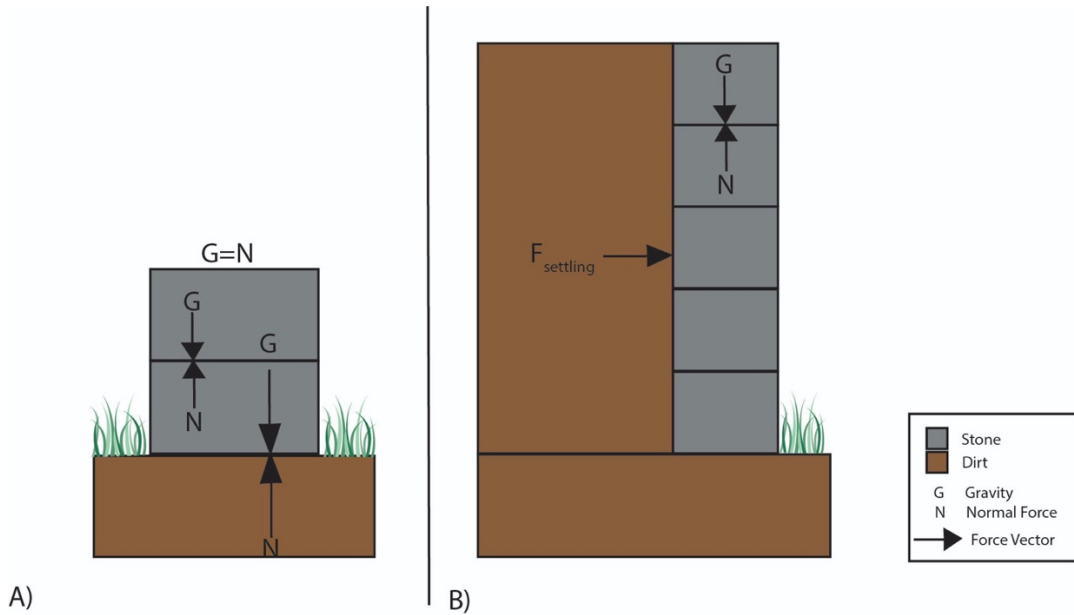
Simplified free-body diagrams of walls. A) A free-standing wall showing balanced forces. This wall is stable and will not collapse. B) This diagram shows a retaining wall or a wall that runs along the outside of a filled foundation, like those built by the Maya (Wernecke 56, 58). As the fill settles over time, it exerts a force on the wall that is not balanced.
